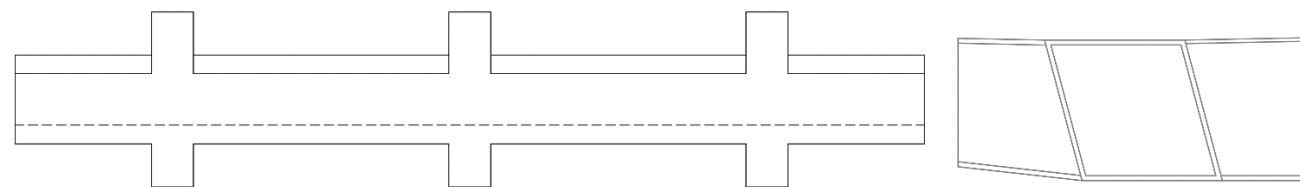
Plan view and cross section of one longitudinal element (approximately 13m)
